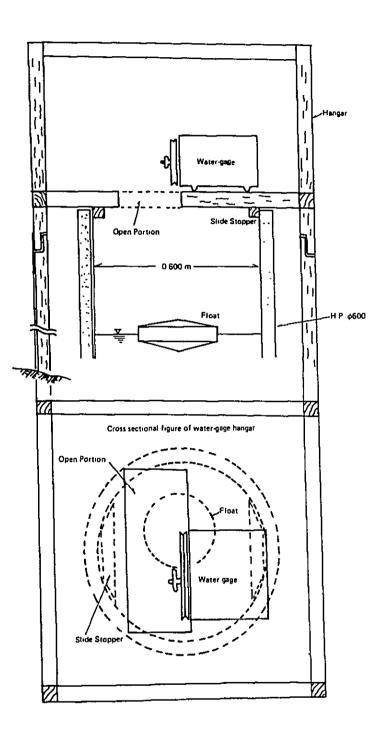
Detail Drawing of Water Gage Installation
